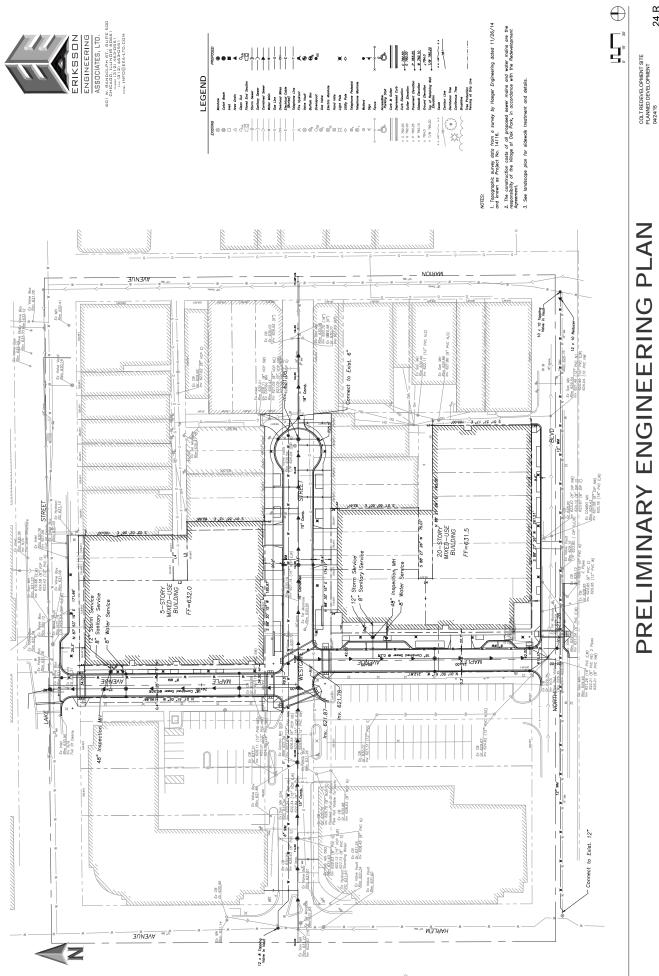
PRELIMINARY ENGINEERING PLAN
